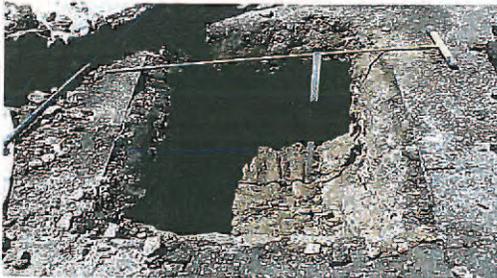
TR002a. Looking toward the west. (yard stick in test pit colored every foot).
